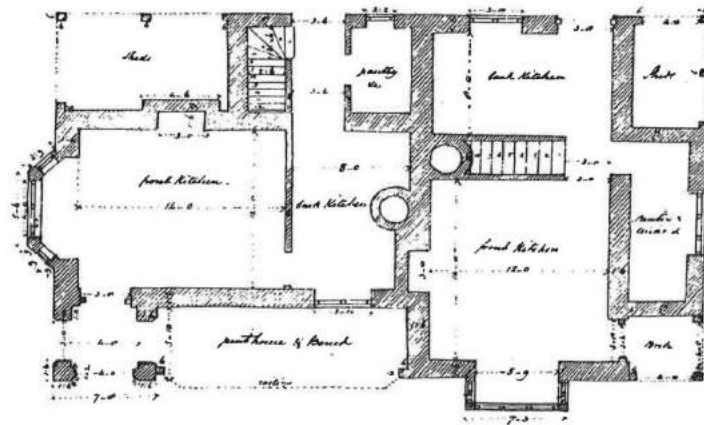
Blaise Hamlet, Double Cottage: a plan from the *Pavilion Notebook*. It differs from the dwellings as built in the placing of stairs, the arrangement of offices and by the presence of a pantry behind the north porch.
